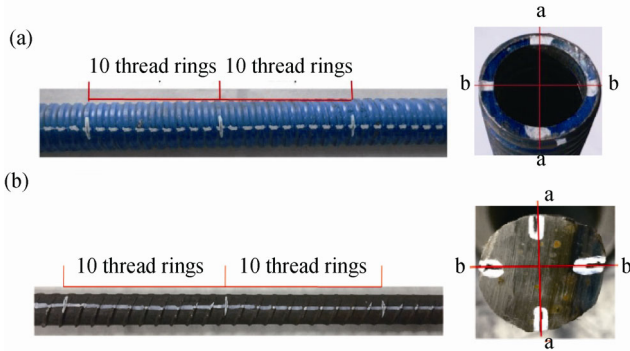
Measurement modes of the bolts: (a) CRLD bolt; (b) rebar bolt.
